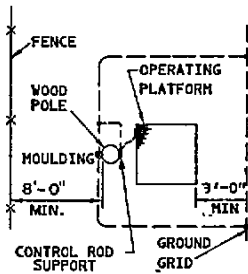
GROUNDING DEADEND (TENSION) STRUCTURE
